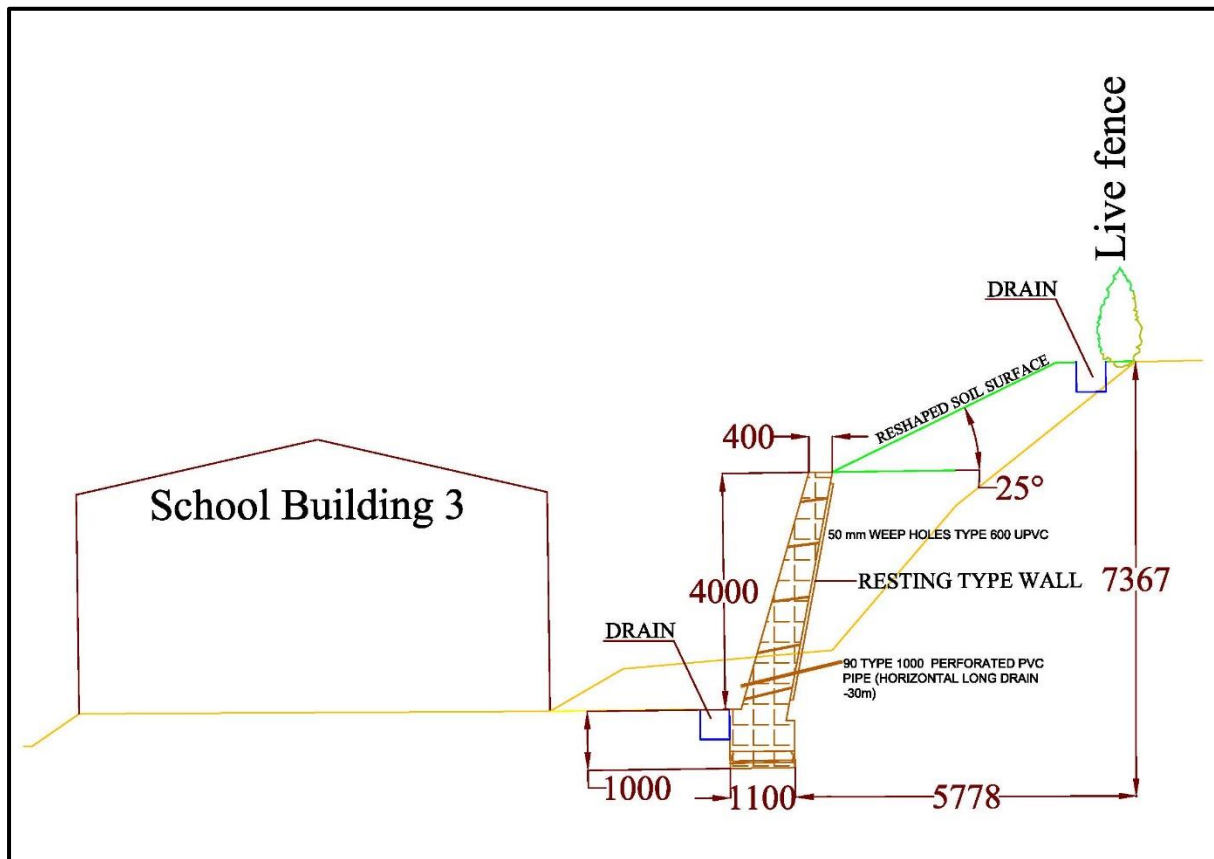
Schematic diagram of the proposed Resting type Wall
